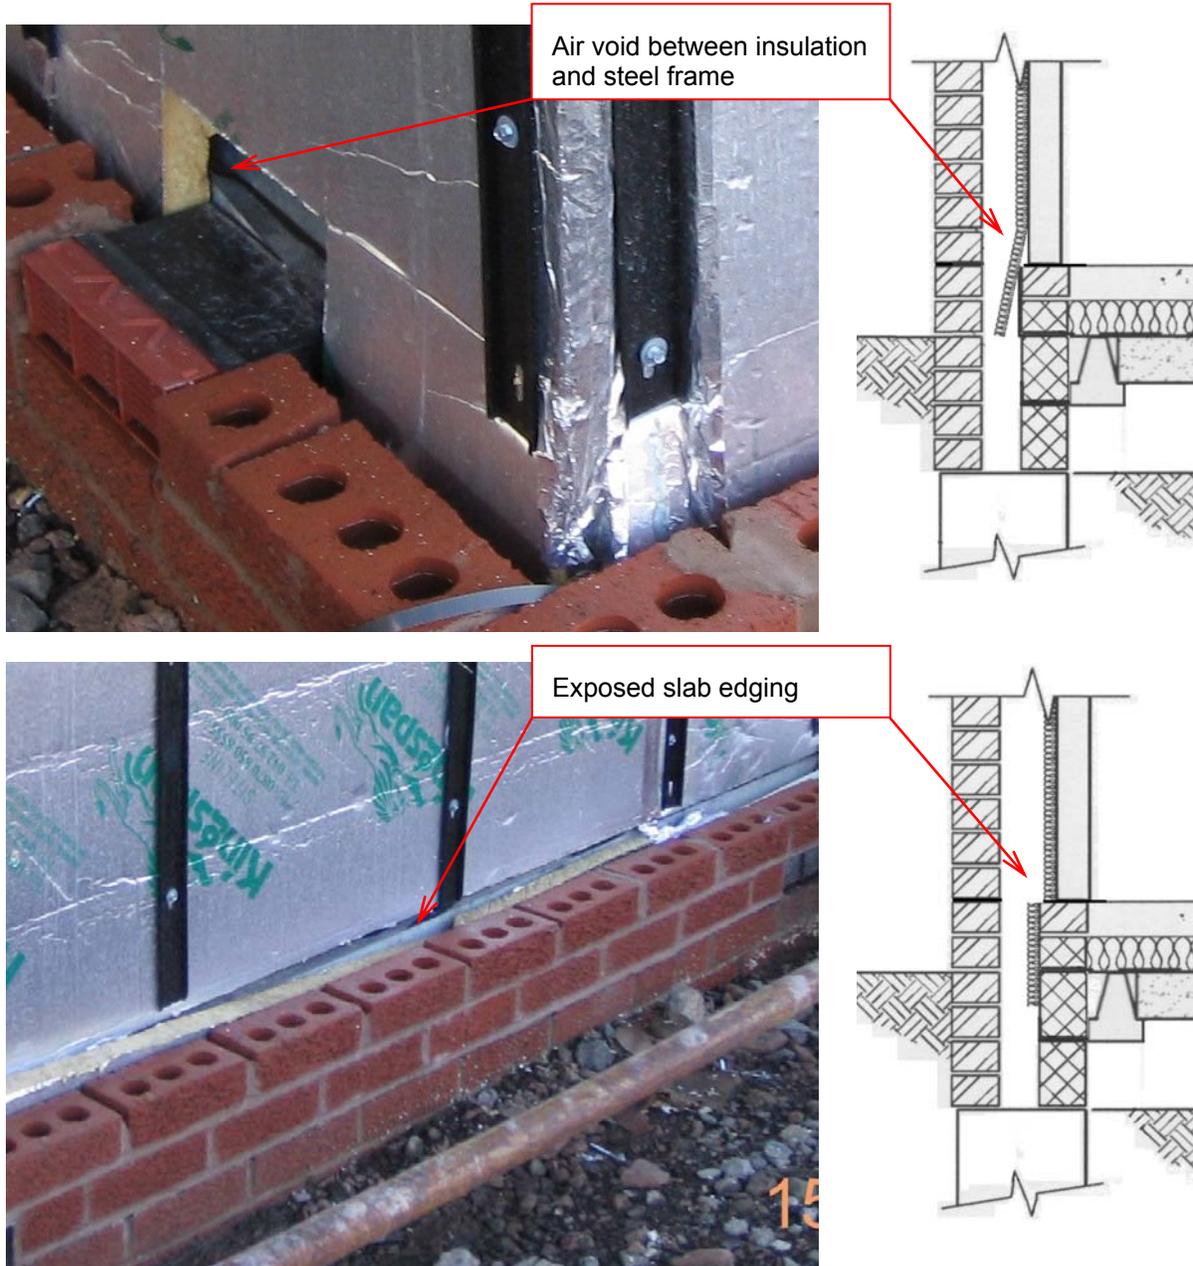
and 3.20 Placement of cavity wall insulation, above and below slab, in steel frame construction with misalignments of steel frame and slab.
